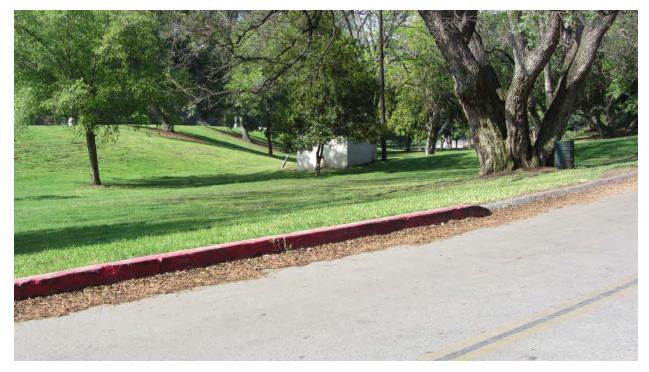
Location of Proposed Potable Water Pumping Station, View Southwest.
